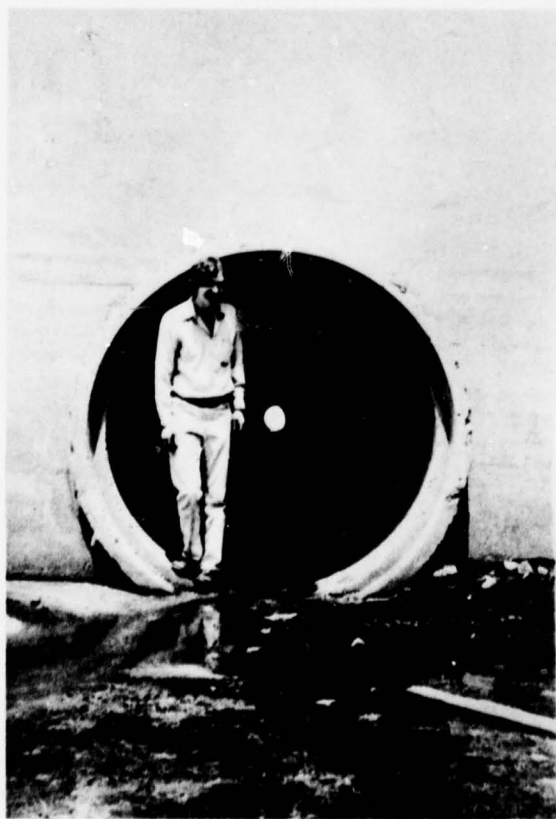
Inlet and 6 ft. diameter concrete pipe discharge culvert.
